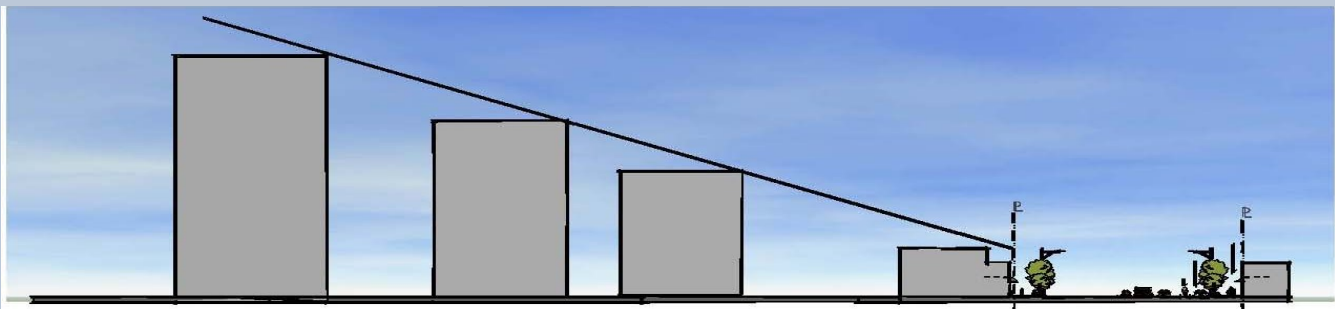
Building Transition from the Railway Tracks to Lakeshore Road East and West. Buildings should also transition from Lakeshore Road East and West to Lake Ontario with the exception of key landmark locations (e.g. Intersection of Hurontario Street and Lakeshore Road East)
